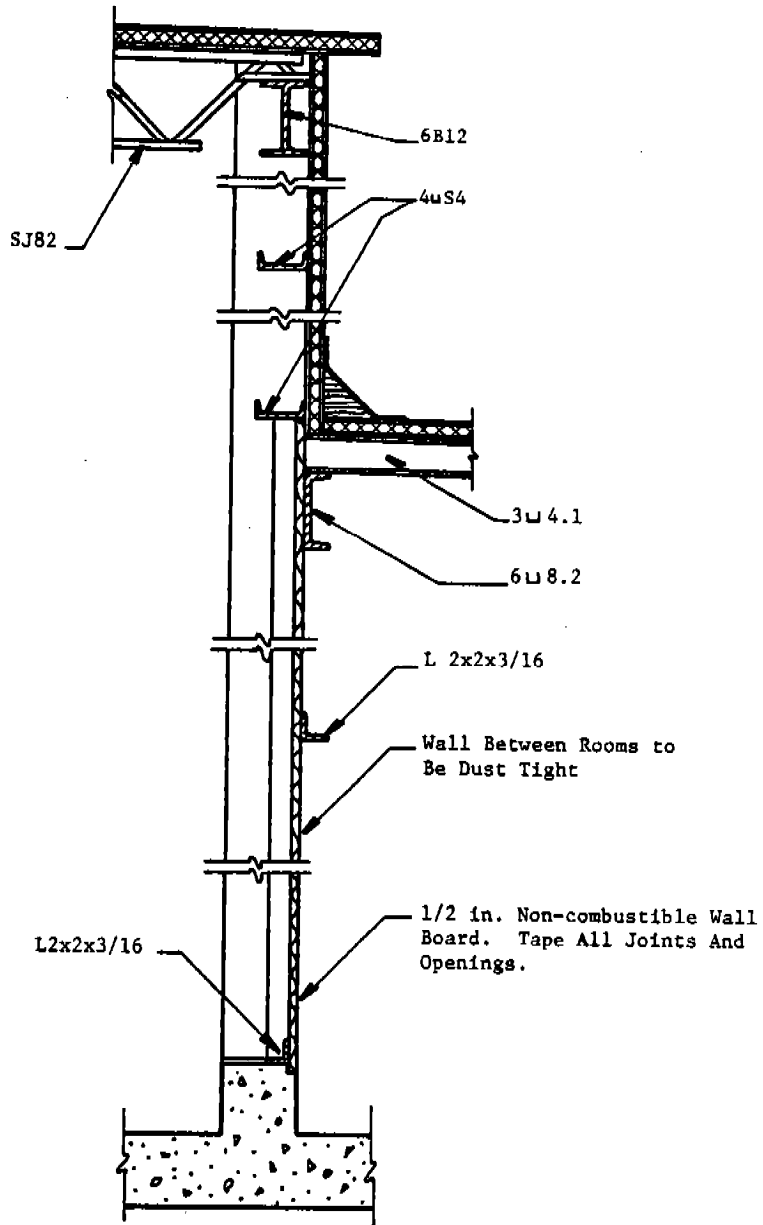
Detail of Venting Wall Panel (Building 11-20)
